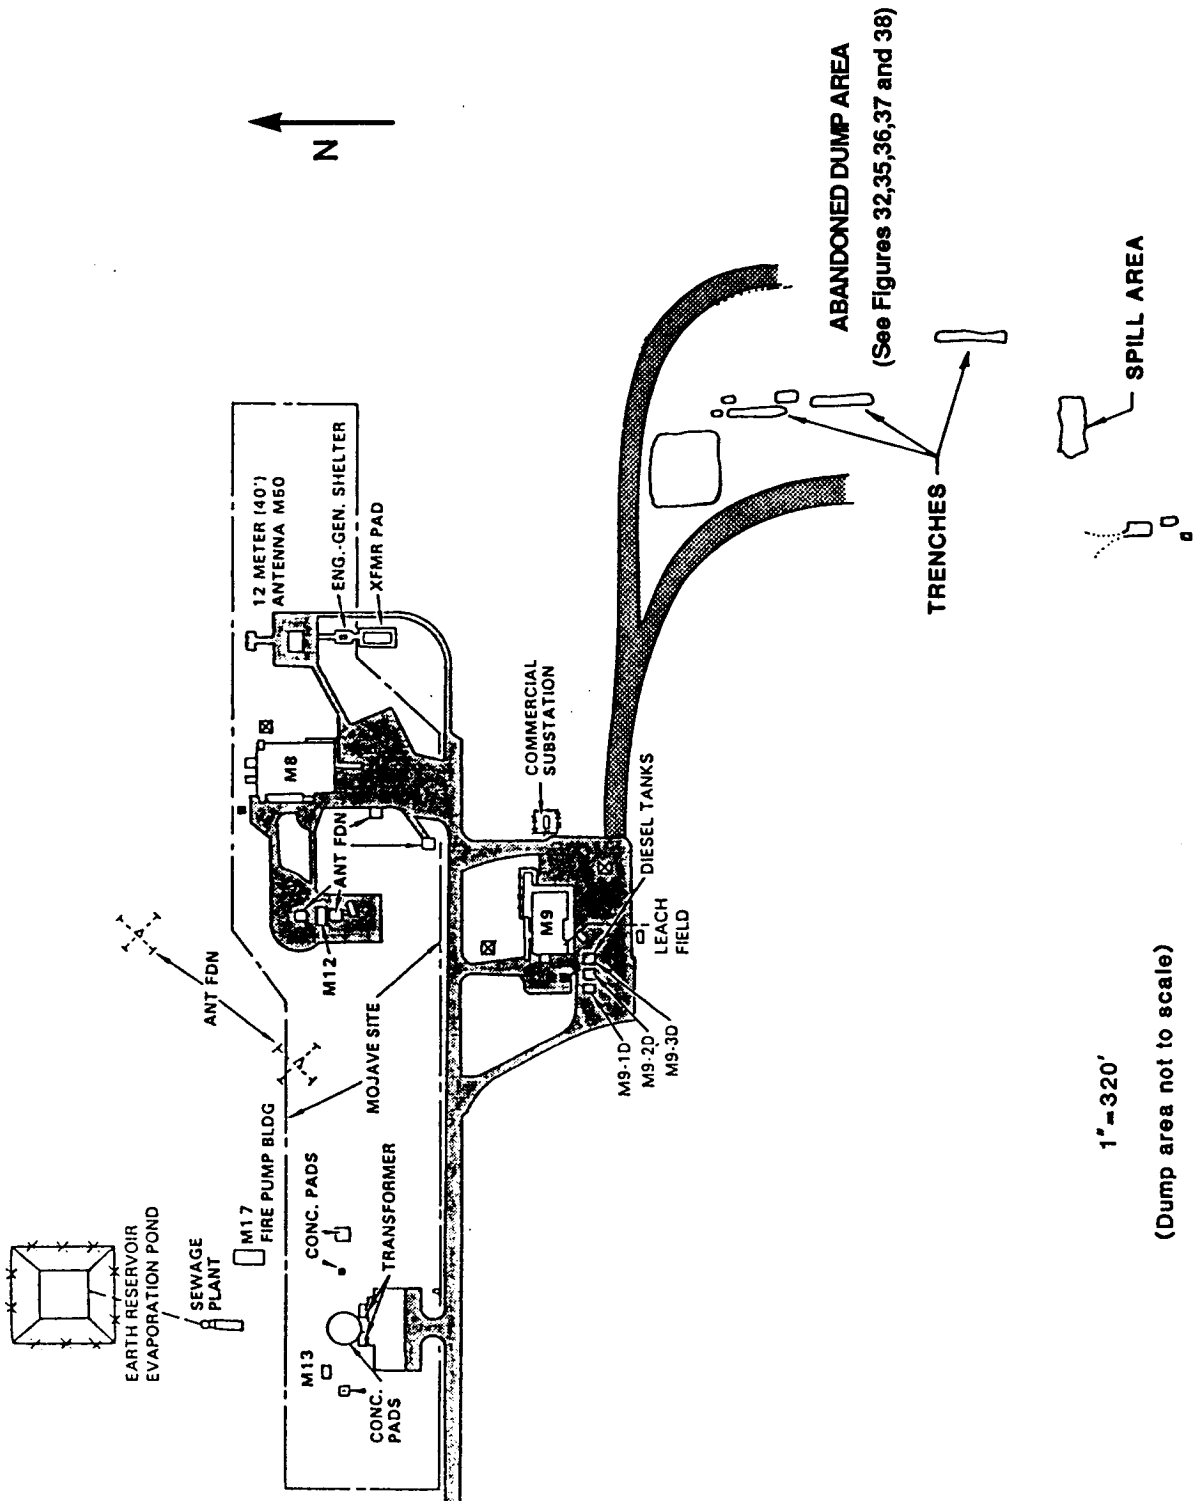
Mojave Base Site: Plot Plan and Location of Abandoned Dumpsite and Abandoned Sewage Plant and Sewage Evaporation Pond
